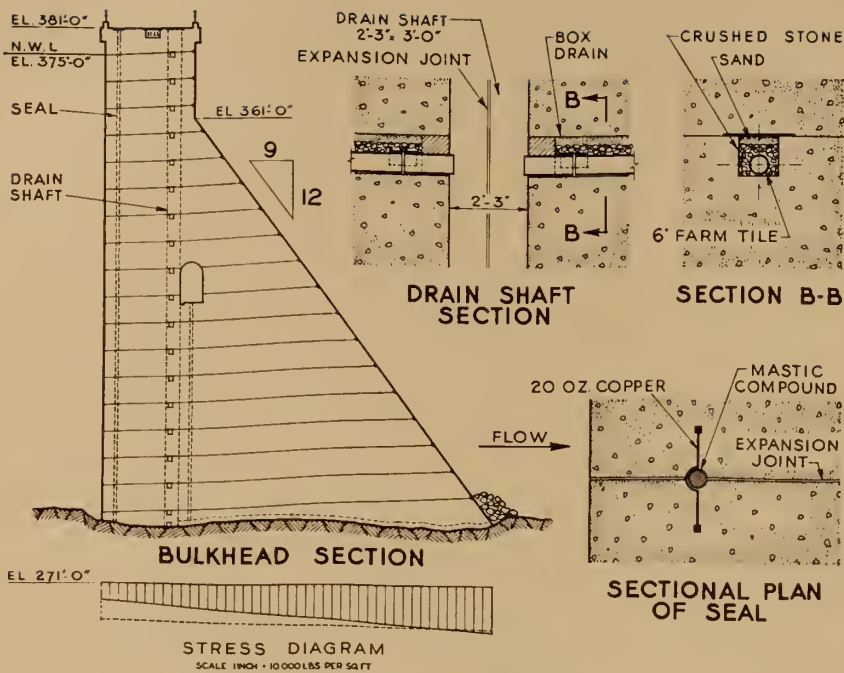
Typical bulkhead section, Peribonka No. 2.
